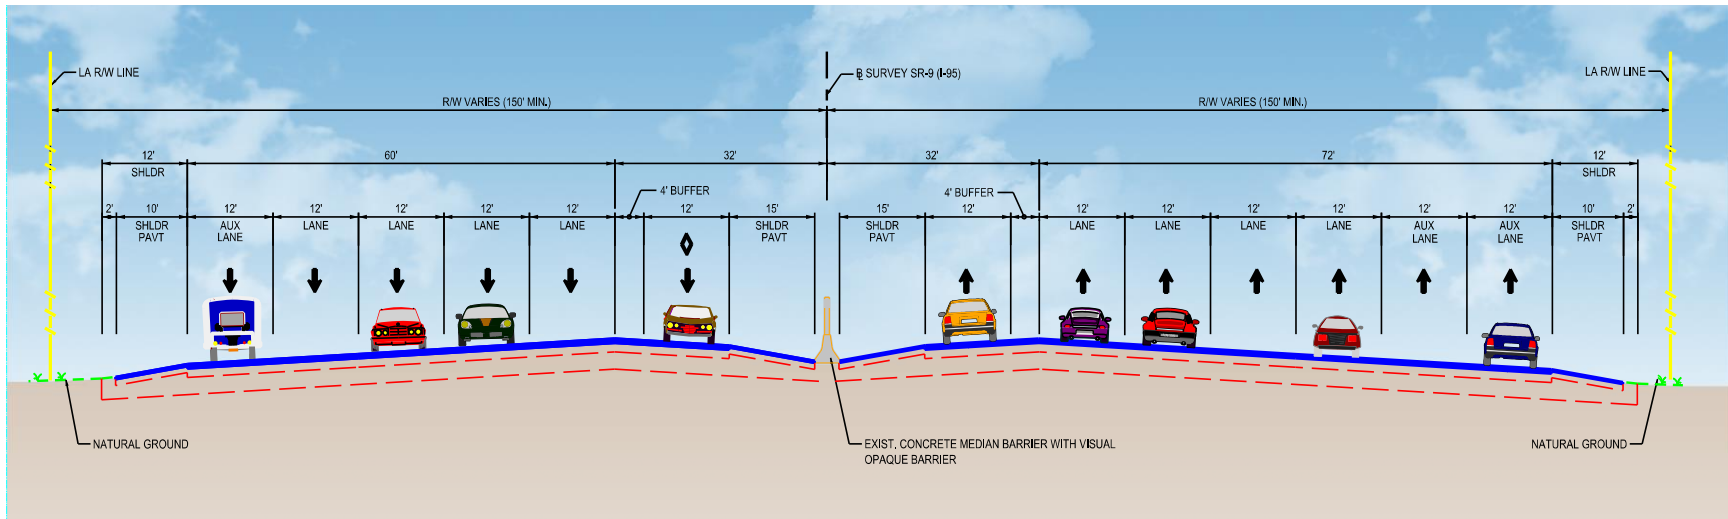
Typical Section – SR 9/I-95 North of Lantana Road
